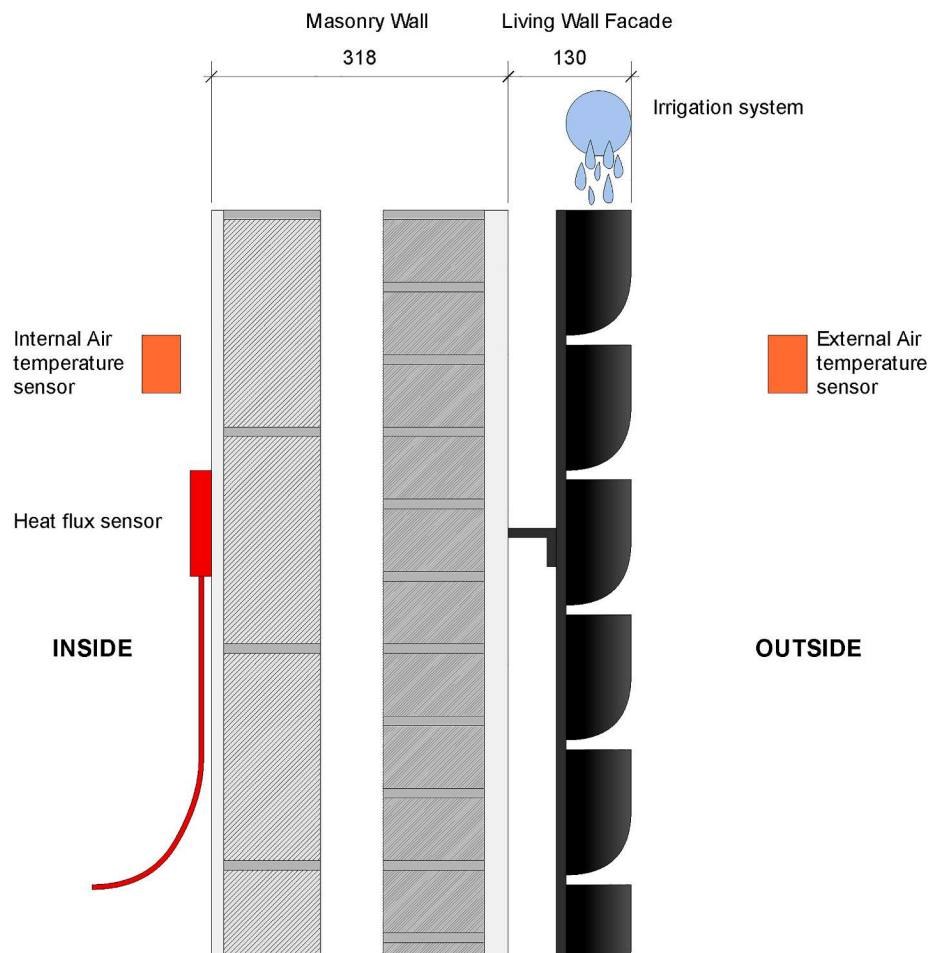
Cross section through the wall showing diagrammatic location of sensors.
